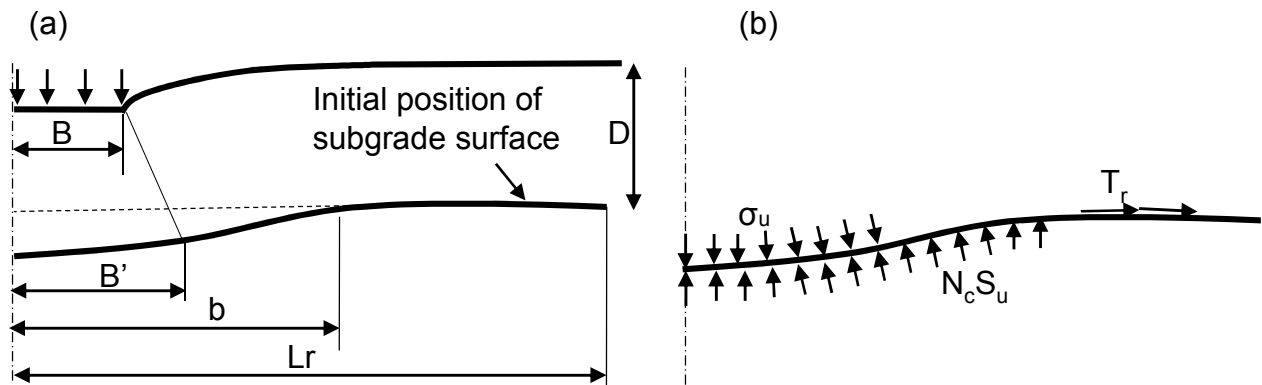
Assumed stresses acting on reinforcement and corresponding deformed shape. (a) Deformed shape of reinforcement. (b) Assumed stresses.
